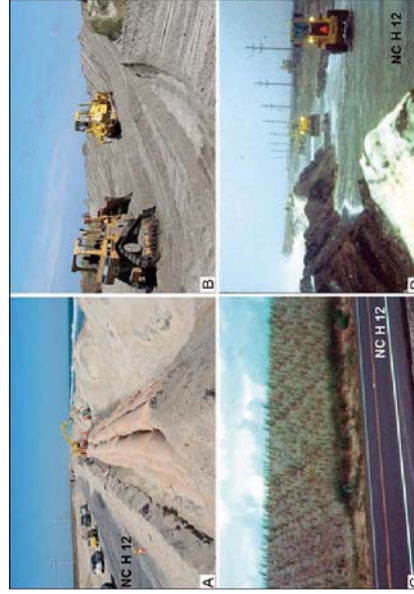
Photographs show the modern rebuilding of constructed barrier dune ridges to protect Highway 12 (A–C). (A) Recently adopted practice of building a sandbag core buried in the dune ridge. Because the constructed dune ridges are out of equilibrium with natural beach dynamics, the beach becomes increasingly steeper and narrower, resulting in more frequent storm surges eroding and overtopping the constructed dune ridge and jeopardizing Highway 12 (D). Photos in A, B, and C are by S.R. Riggs; photo in D is from Pilkey and Thieeler (1992).
